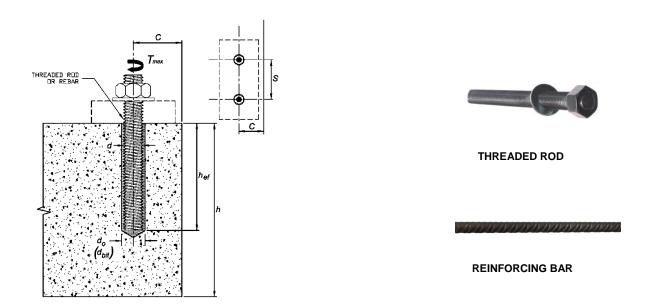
INSTALLATION PARAMETERS FOR THREADED RODS AND REINFORCING BARS
